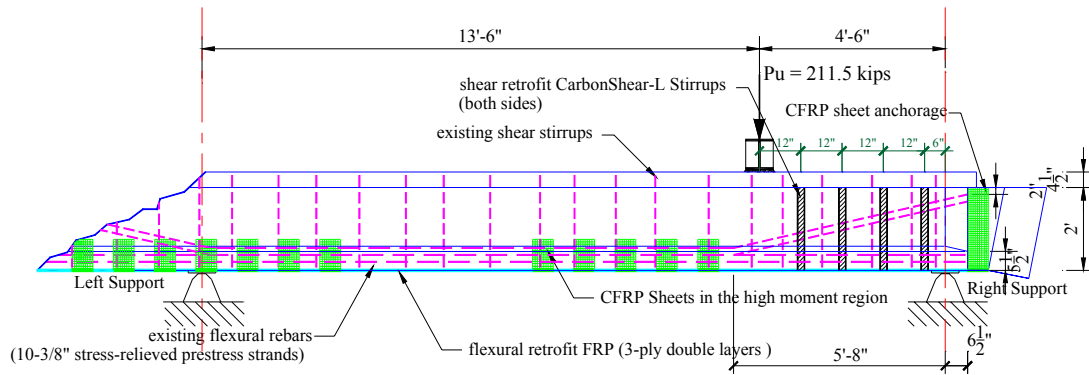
Layout of the T-Beam 3 with shear retrofit
